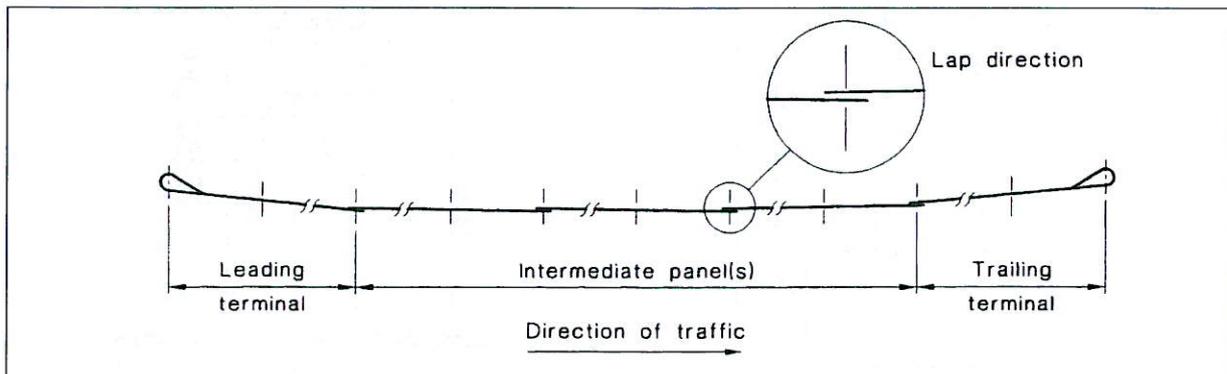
Typical safety barrier layout – plan view (AS3845:1999)
